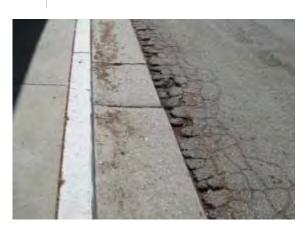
ROADWAYS, ASPHALT PAVEMENT
